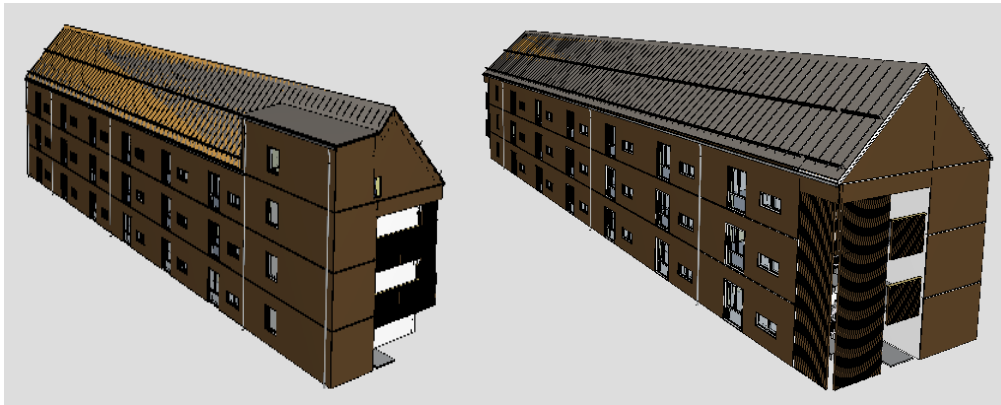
Picture of the new building. Screenshot from SimpleBIM
